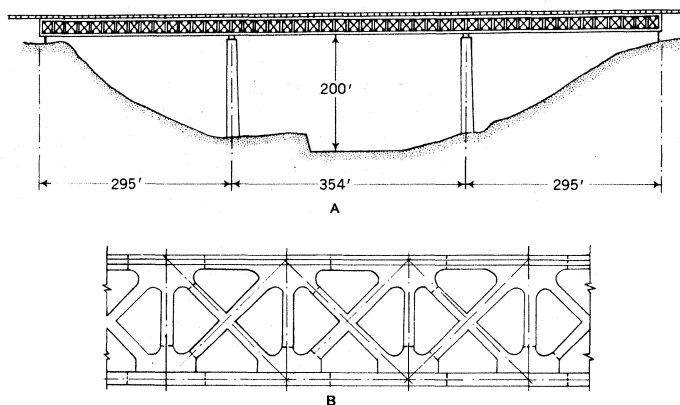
(A) FIRST PRESTRESSED-CONCRETE LATTICED TRUSS, MANGFALL VALLEY BRIDGE, WEST GERMANY: (B) DETAIL OF TRUSS
